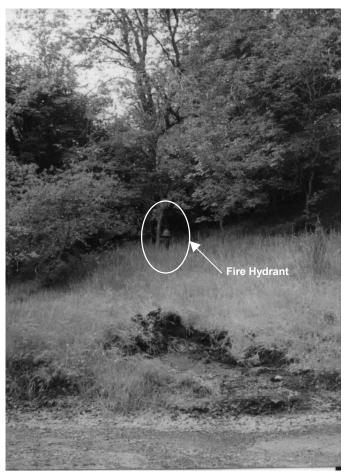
INACCESSIBLE FIRE HYDRANT
